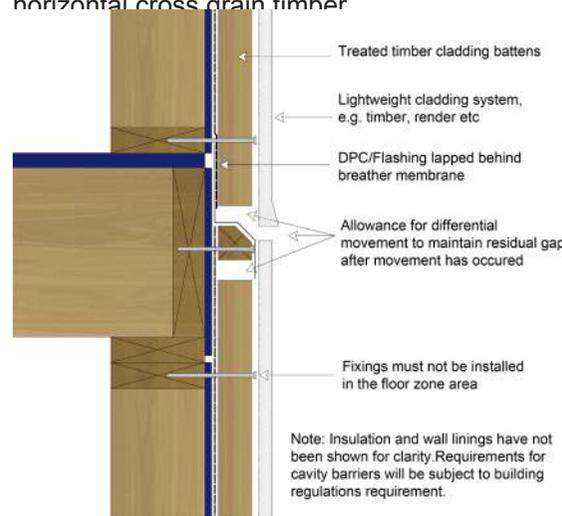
Differential movement at floor zone with cladding supported on timber frame
